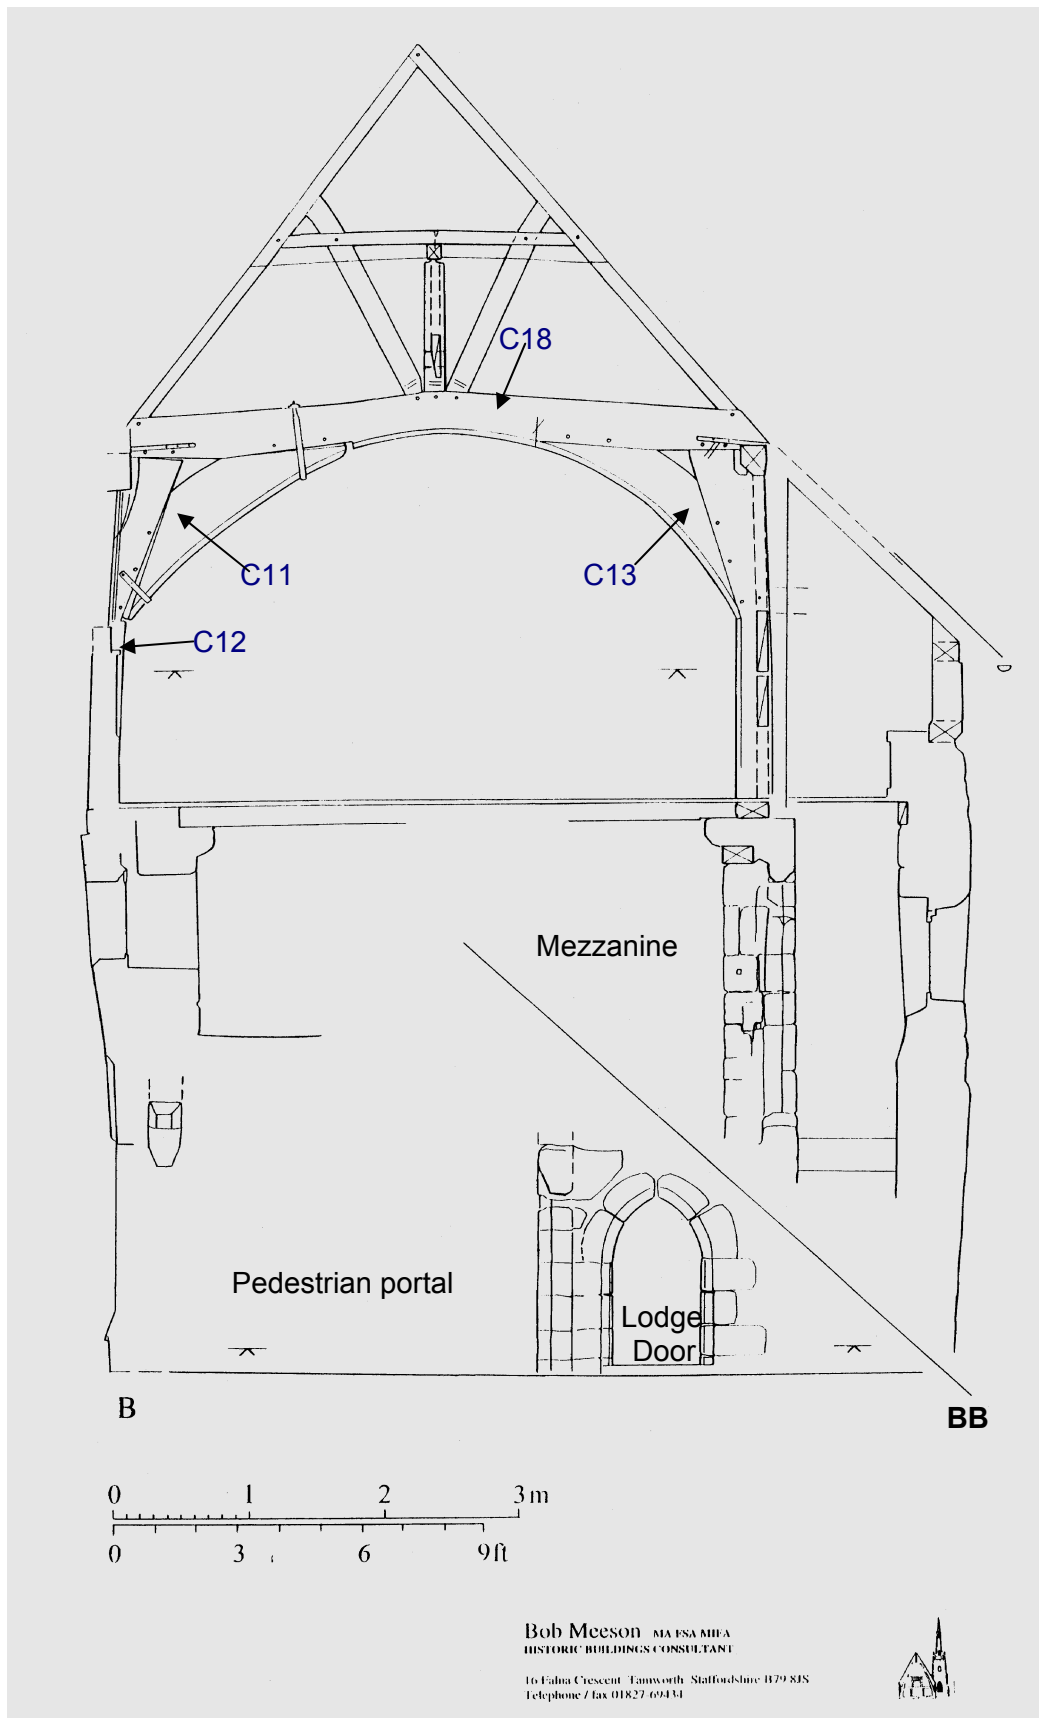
Gatehouse; drawing to show sample locations from truss B (viewed looking east) (after Jean and Bob Meeson)
